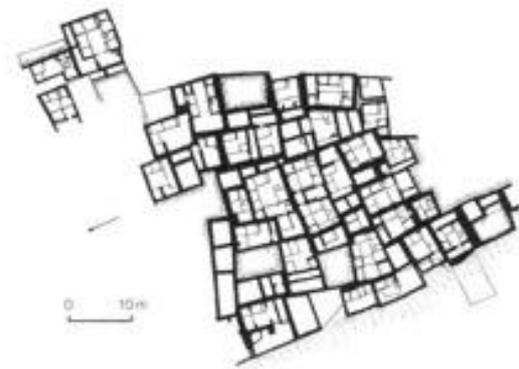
Plan of James Mellaart's excavations showing the dense house layout (URL-4)
